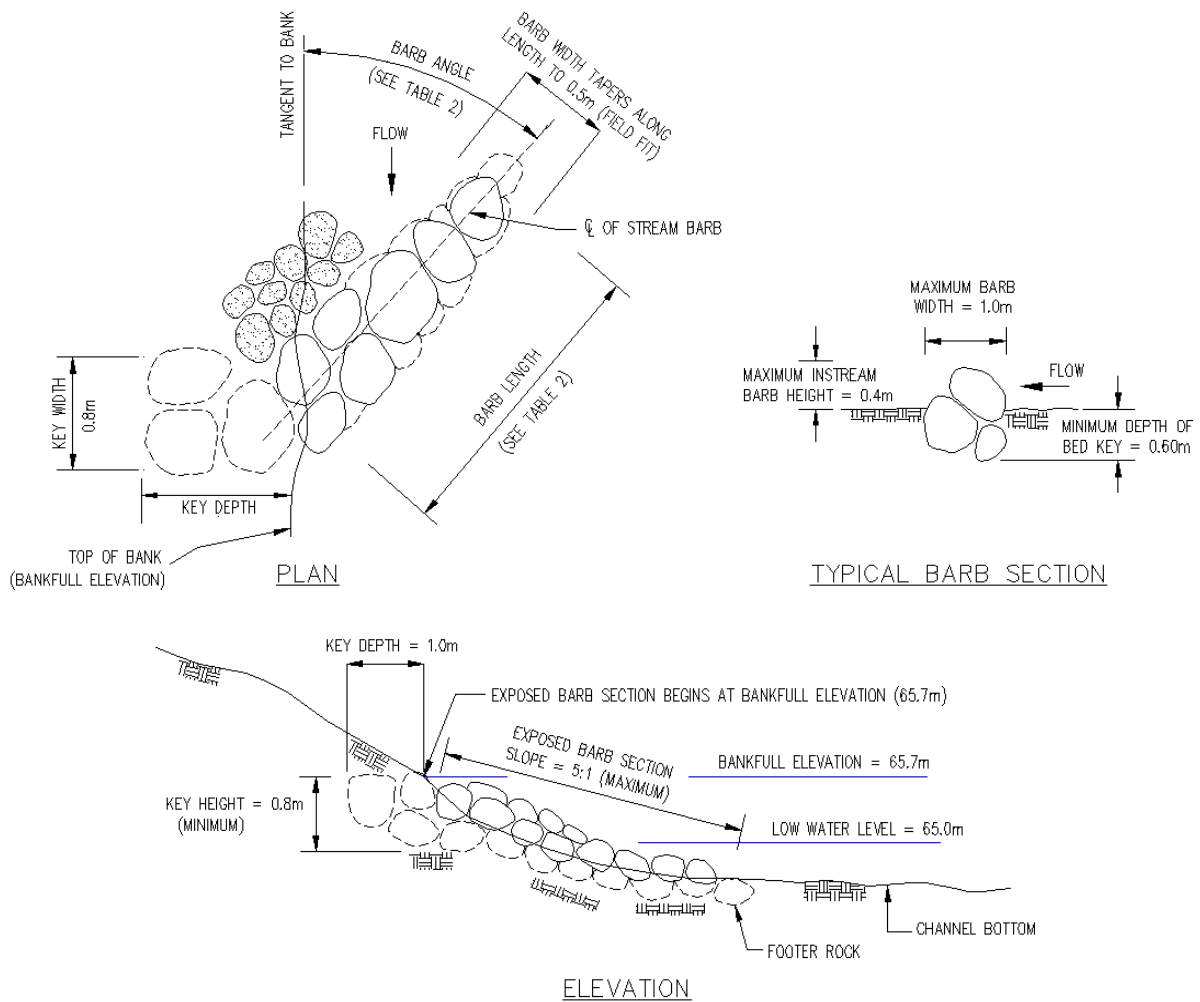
Barb design details: Plan (top left); Section (top right); and Elevation (bottom) views. Table 2 refers to Table 3.1.2.
